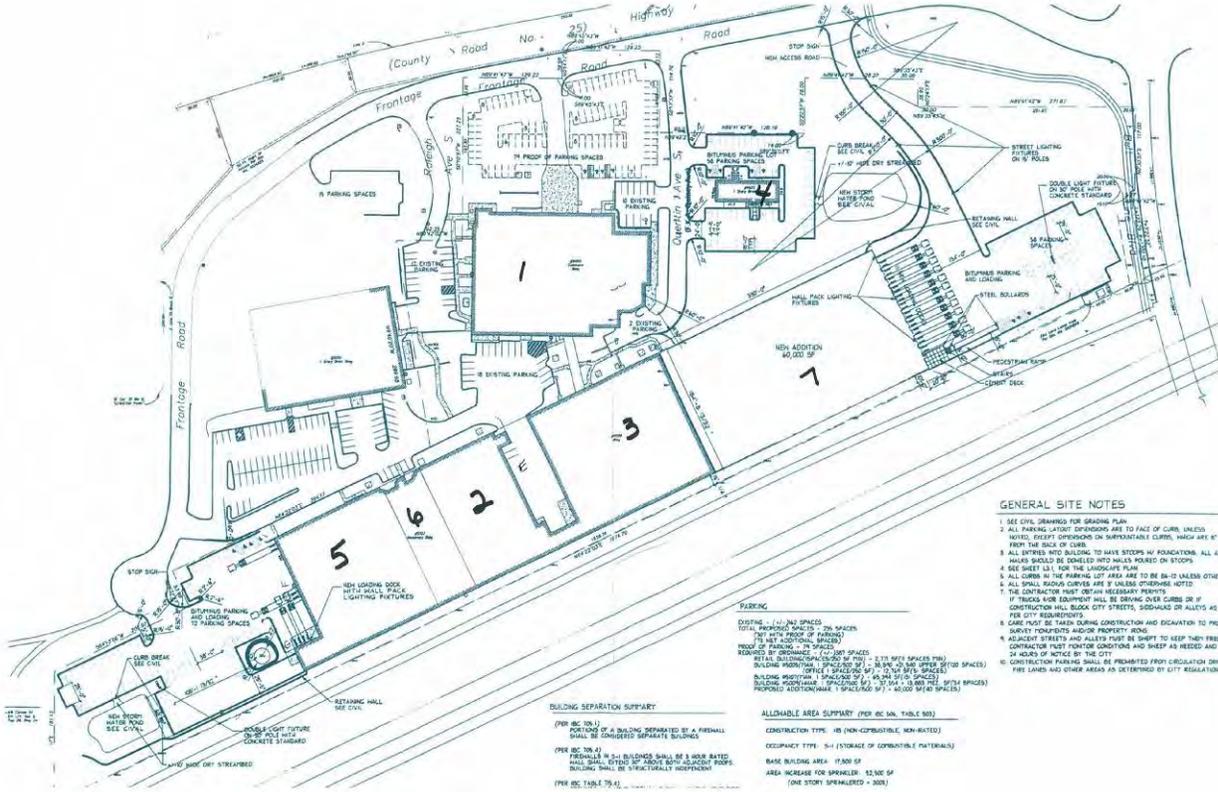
Current site plan for the Northland Aluminum Products site. The buildings have been numbered in chronological order of date of construction with the exception of Building #4, which was purchased and added to the complex in 2006.
